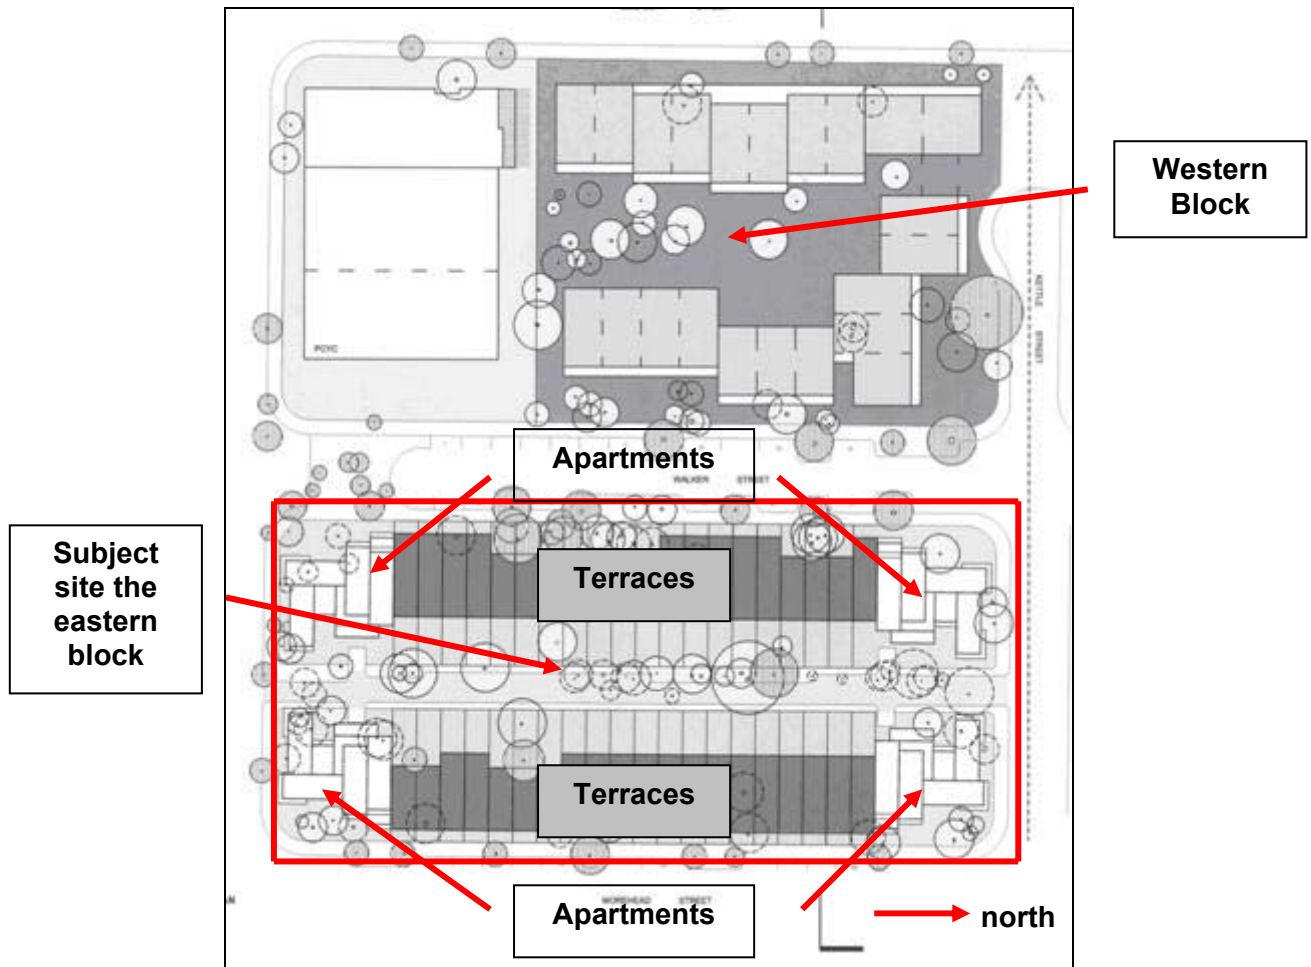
Approved 2003 Master Plan site layout for eastern and western blocks.
